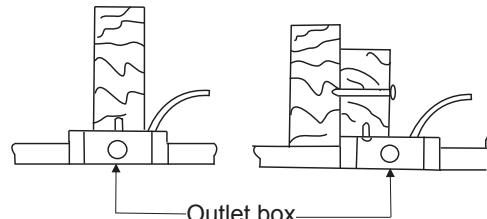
, 2, and 3 are examples of different ways to mount the outlet box.
